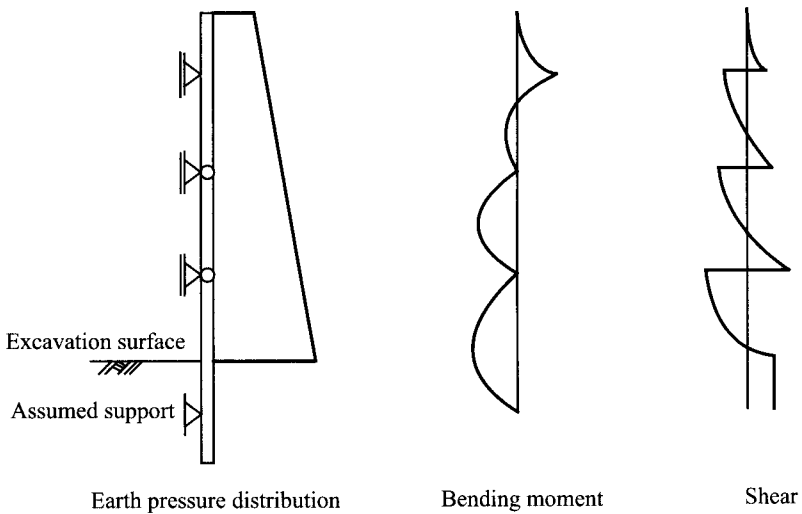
One-stage loading simply supported beam method (the simply supported beam model).
